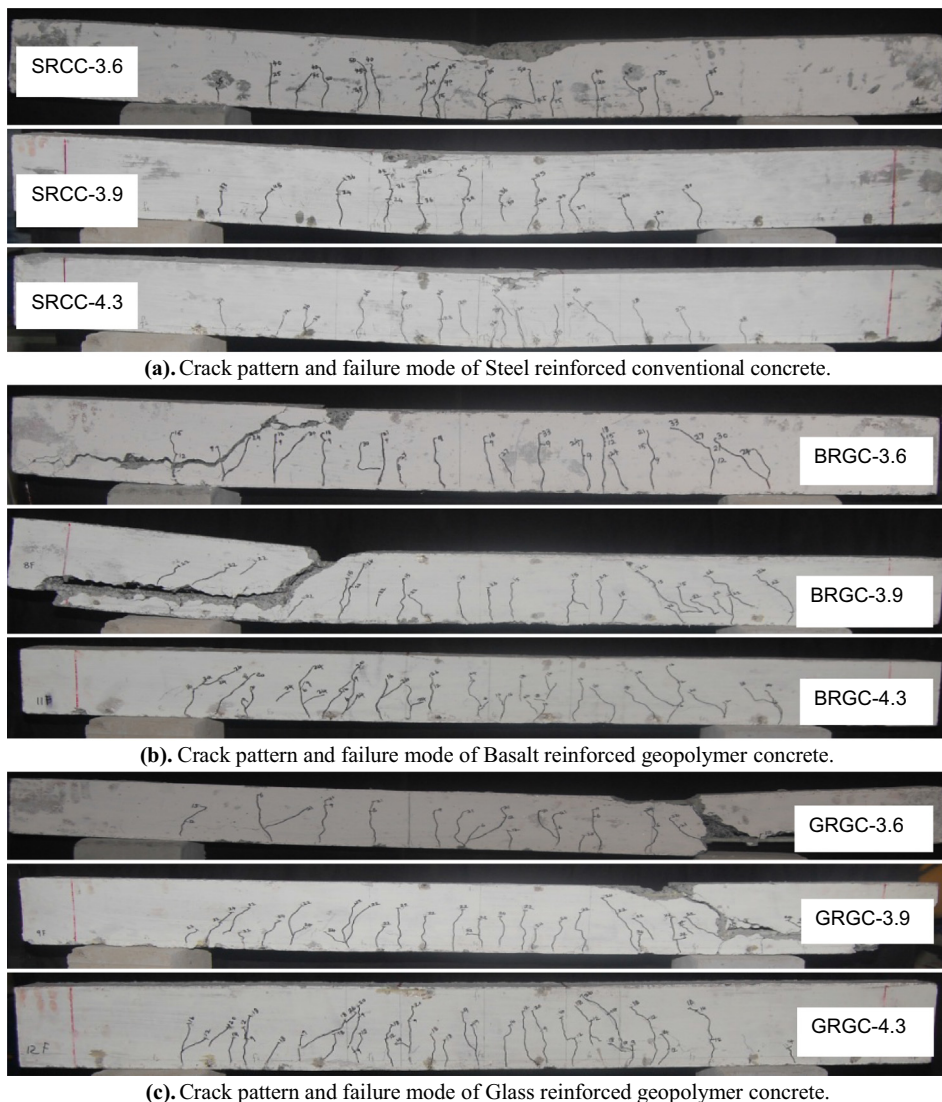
(a). Crack pattern and failure mode of Steel reinforced conventional concrete. (b). Crack pattern and failure mode of Basalt reinforced geopolymer concrete. (c). Crack pattern and failure mode of Glass reinforced geopolymer concrete.
